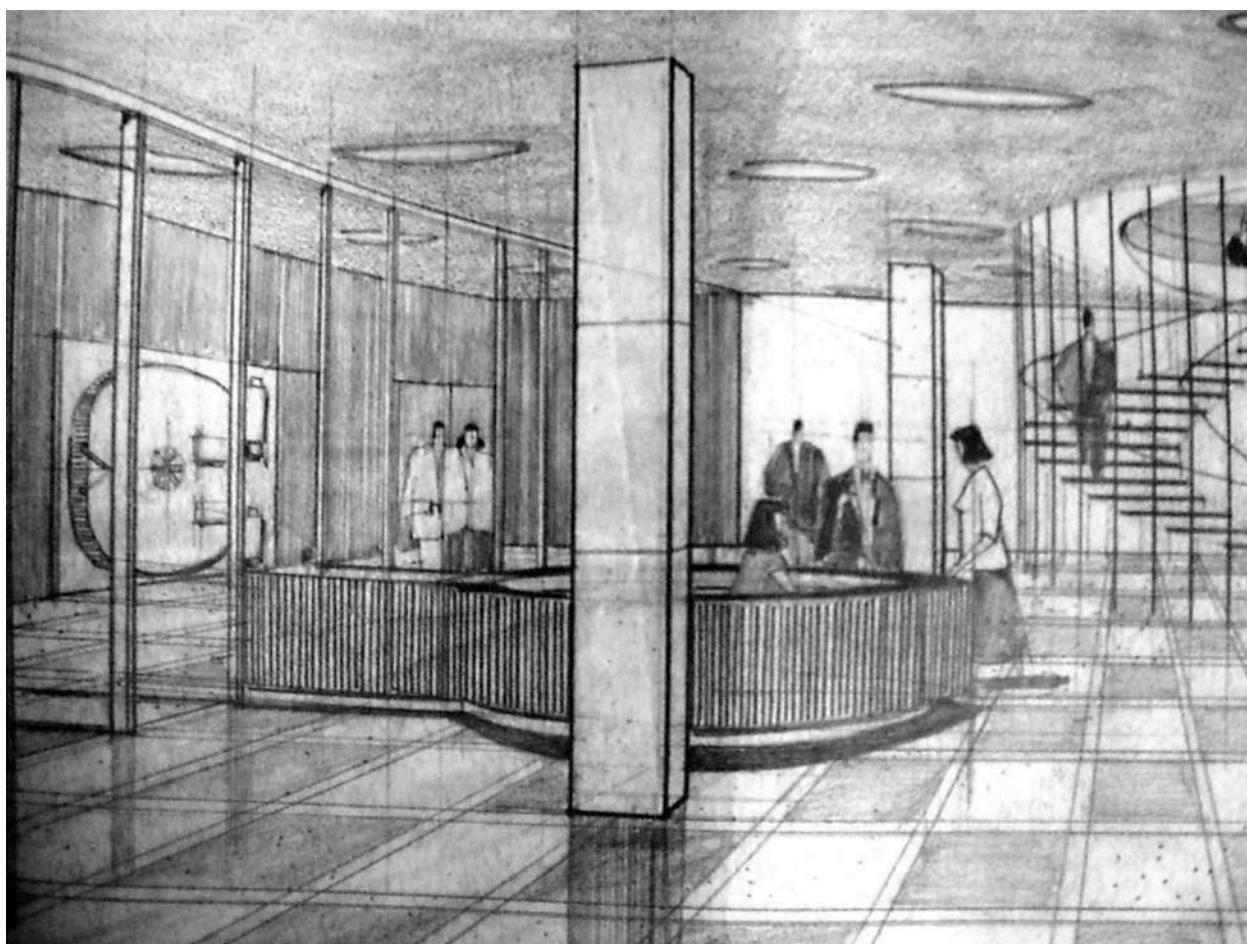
Spiral Stair and Vault Area below Main Banking Floor Brandow Archive.
